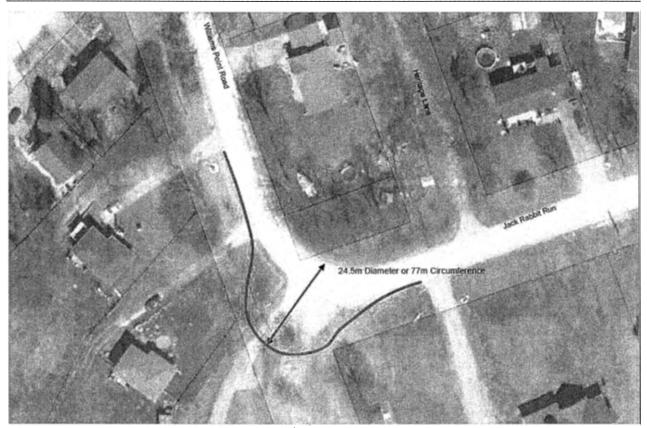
Proposed Location of Turnaround for Williams Point Road/ Jack Rabbit Run
